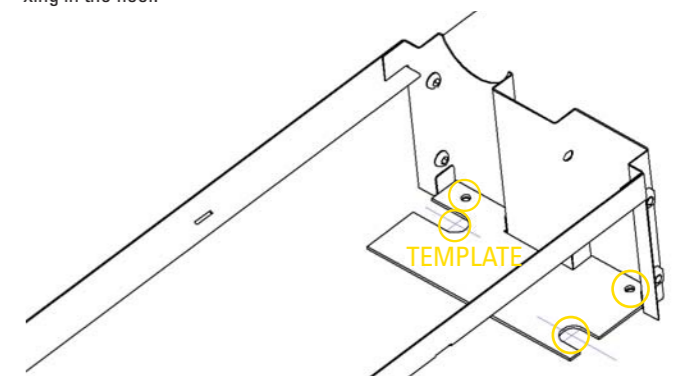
Mark the heating water pipe position, return pipe position, and convector mounting holes on the floor. Connect the supply pipe to the bottom outlet of the heat exchanger. This is where the thermostatic valve is installed. The screw fitting is installed on the outlet - top pipe.
